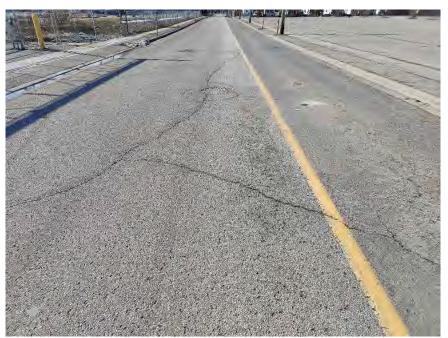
First Avenue, approximately 45 m East of Front Street, looking East, showing slight to moderate longitudinal and transverse cracking associated with slight random cracking, slight pavement edge cracking, slight pavement rutting, and moderate pavement raveling.
